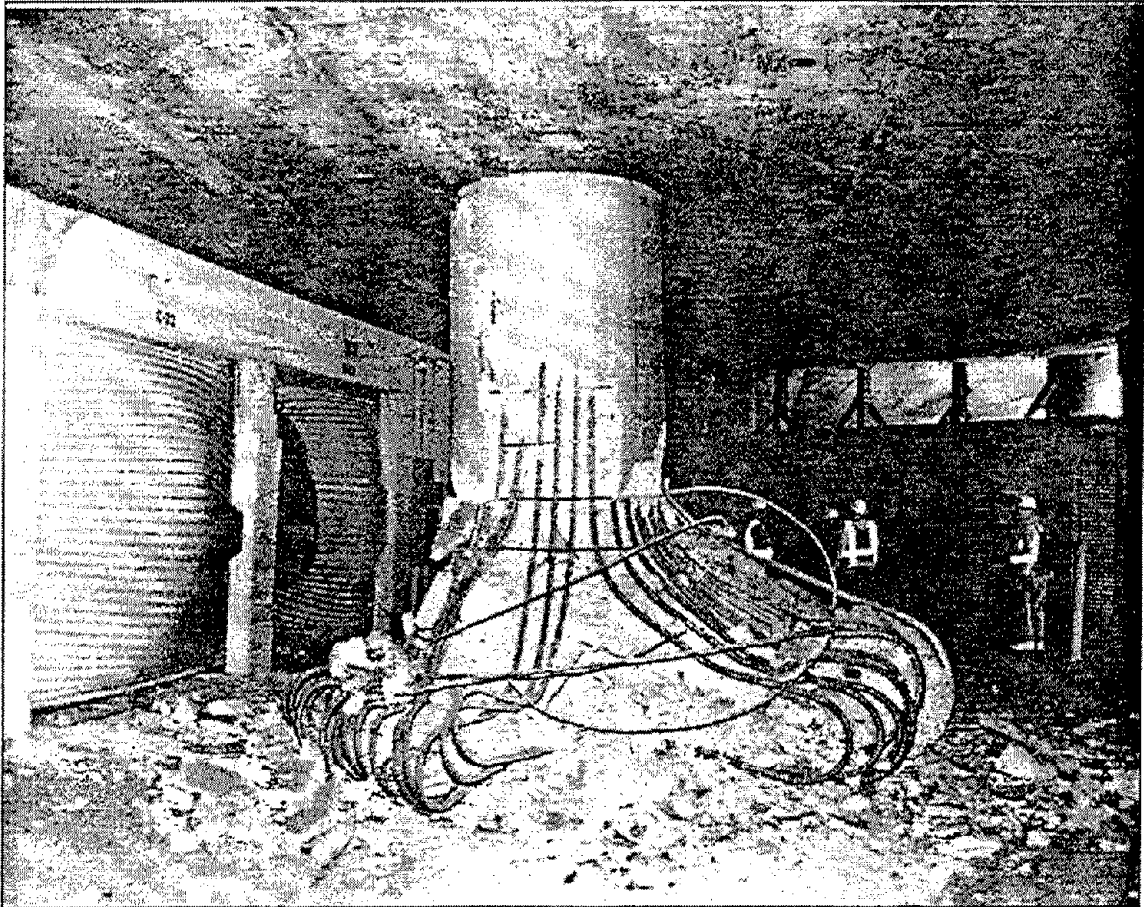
Damage to La Cienega-Venice Undercrossing.
